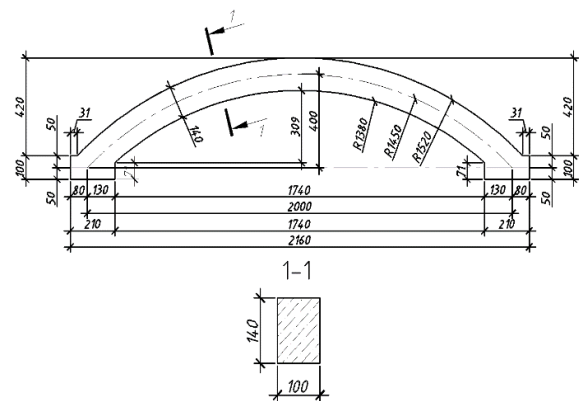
Geometric dimensions of the reinforced concrete arch prototype.
